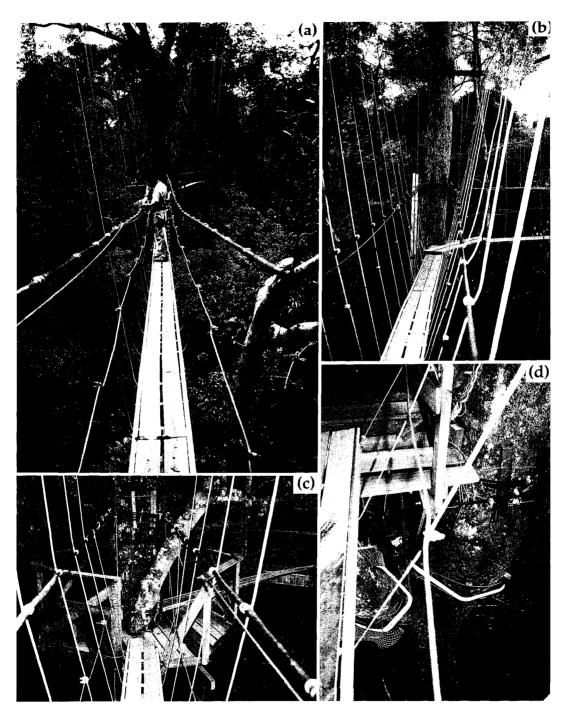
Walkways. (a) walkway 3, (b) walkways 6 and 7 and an aluminum ladder set on the pier trees of W6 and W7, (c) the platform on the pier tree of W2 and W3, looking from W3, (d) the supporting woods for the platform on the pier tree of W1 and W2.
